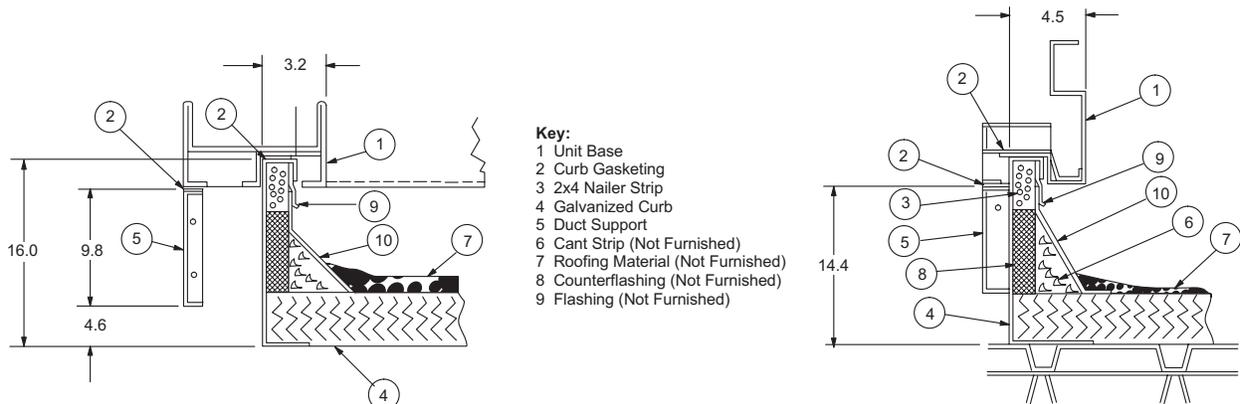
Roof Curb without Blank Compartment (Out of Airstream)
